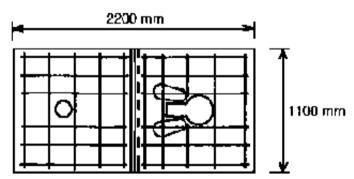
Reinforced concrete rectangular slab (for details of reinforcement see Table 7.1) (Plan)
